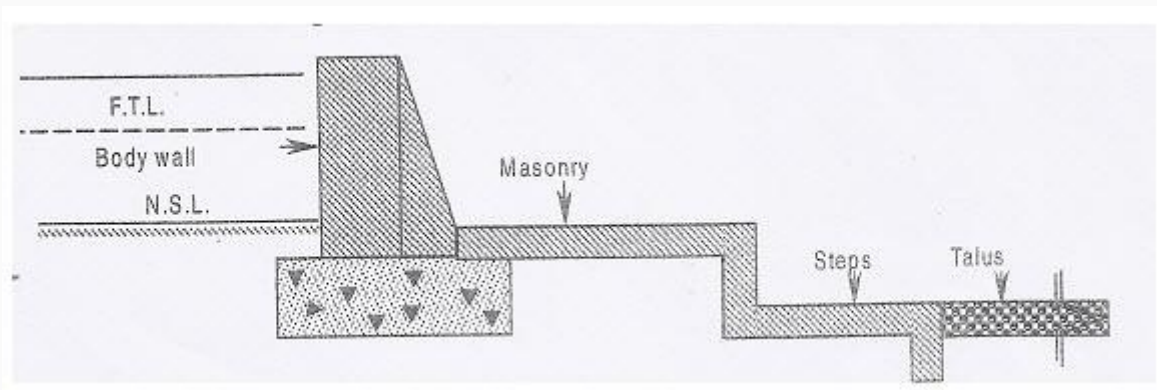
Masonry weir with stepped apron. (Source: Patel and Shah, 2008)
